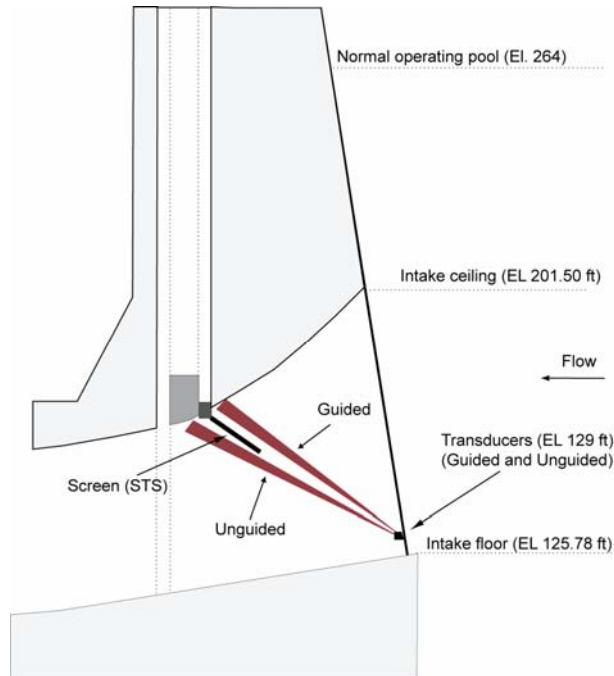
Side View of a Turbine Intake Transducer Deployment.
